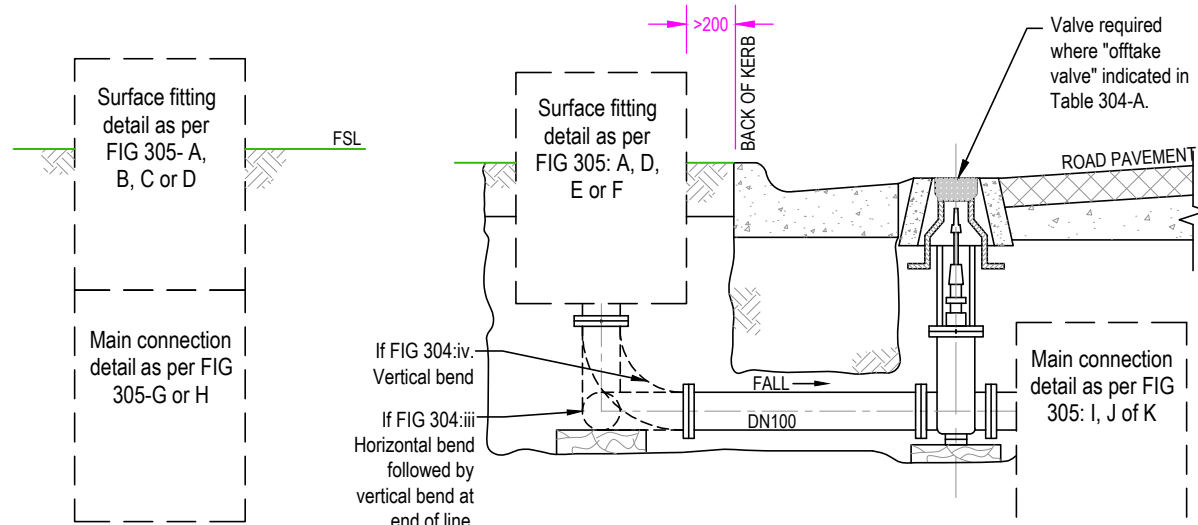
i: SECTION VIEW. IN LINE ARRANGEMENT
